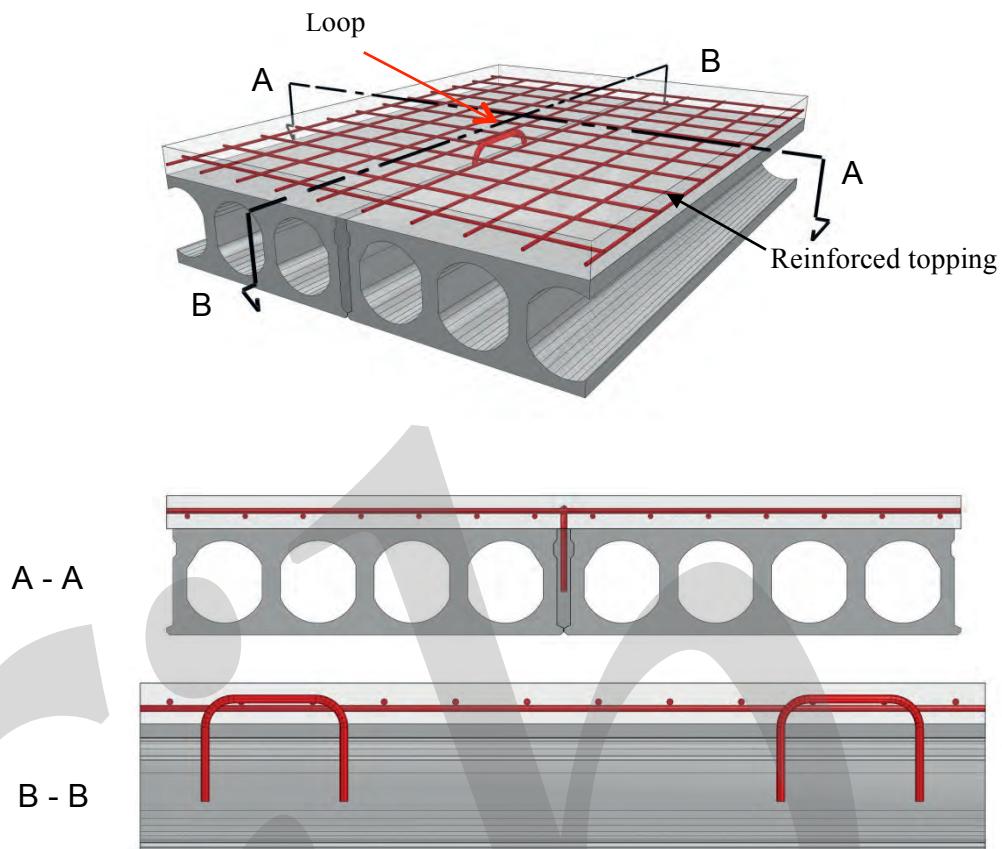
Typical details for a topped hollow-core floor to ensure full transfer of longitudinal shear in the interface of precast units and structural topping. Generally, loops in longitudinal joints between floor units may be omitted.
